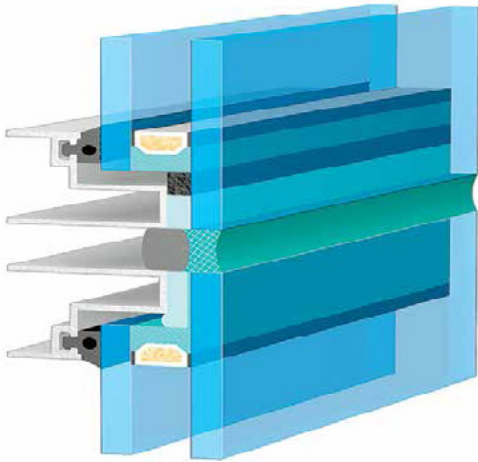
Stepped IGU structural glazing design that structural silicone is used to bonding outer longer glass lite.
